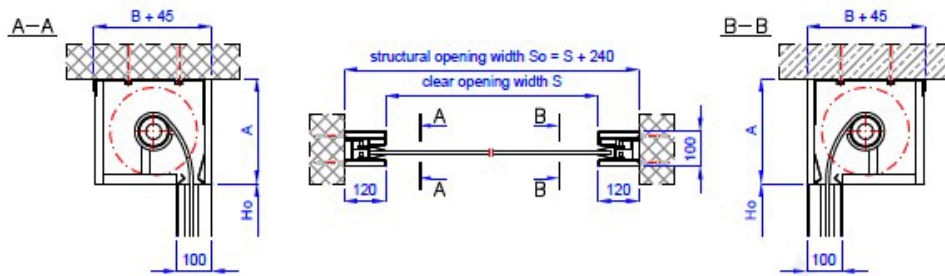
Fire protection curtain door EI120, corridor (niche) mounting
